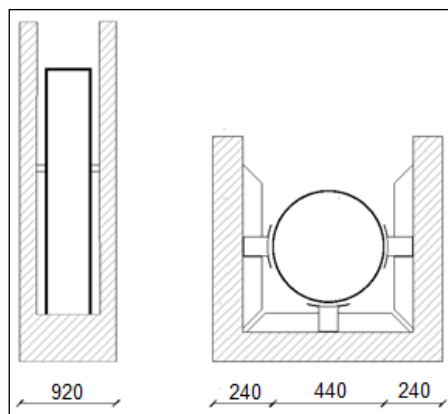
Horizontal cross section of the bay walls and the NPMs, not to scale. Enlarged vertical and horizontal section of single bay wall and the NPM is shown above, all dimensions are in cm.
